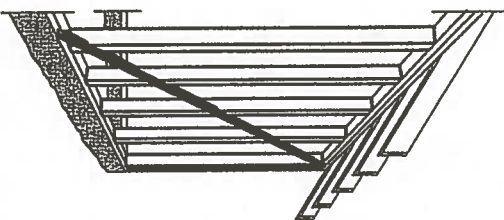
B-TYPICAL TWB (T-TYPE) EXTERIOR WALL BRACE INSTALLATION (MAXIMUM 3/8"-INCH DEEP SAW KEYS IN STUDS)
